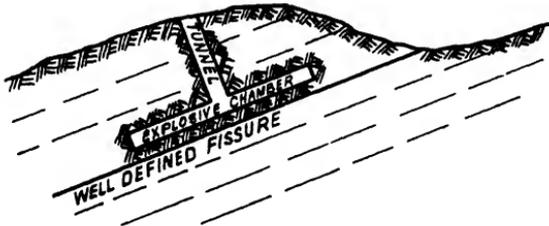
PLAN OF QUARRY FACE READY FOR TUNNEL BLASTING
